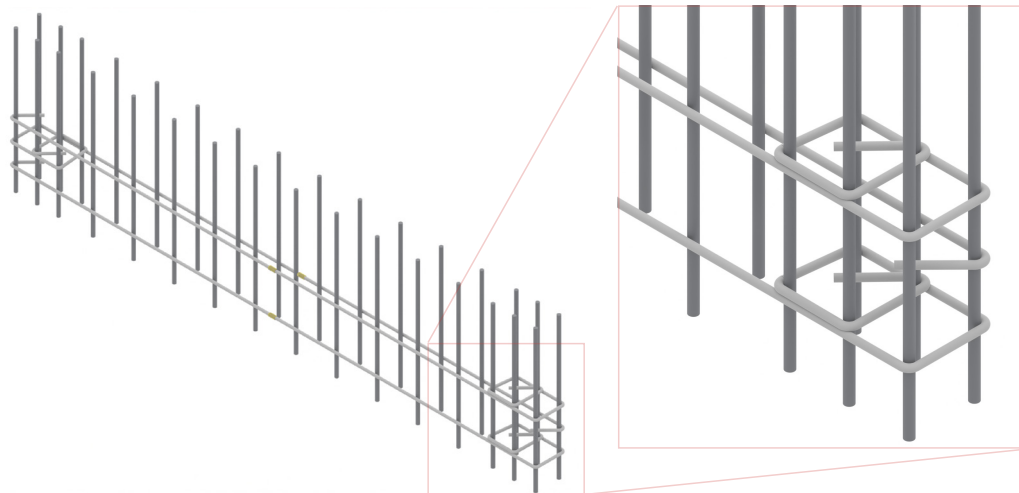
Reinforcement cage of the shear wall showing the longitudinal rebars and alternating stirrup placement, with stirrups looping around the edge longitudinal rebars and finished with 135° hooks on alternating faces of the wall (author's own work)
